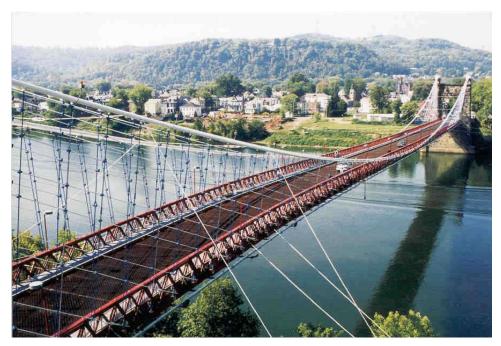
Cable Damping System - Wheeling Suspension Bridge (Photo Courtesy of Geoffrey H. Goldberg, 1999)
